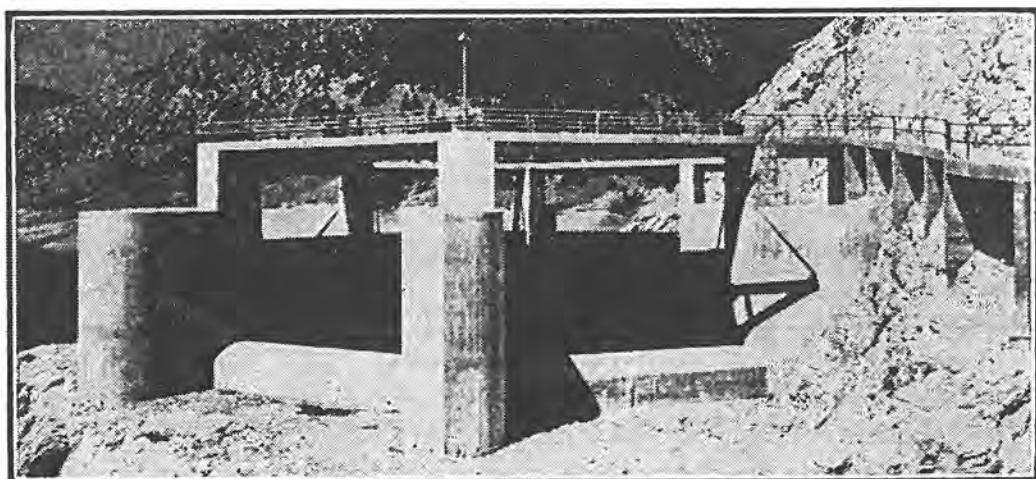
GIBSON DAM SPILLWAY GATE STRUCTURE
